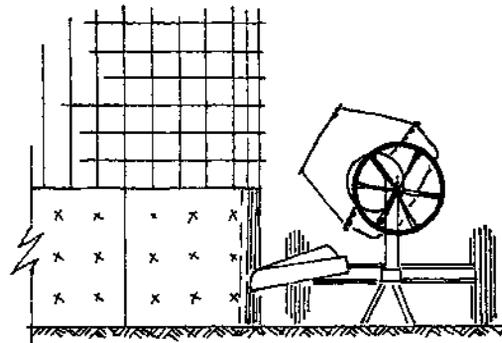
Sheet Metal Forming. (Note hole in backup sheet for mixer chute.)
